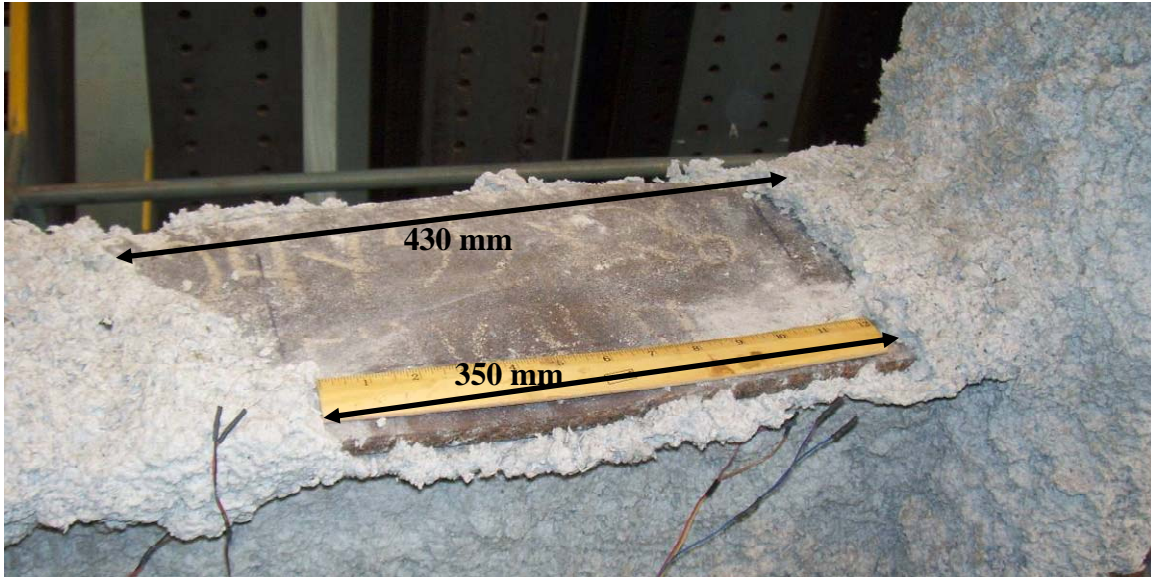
Top flange of DM assemblage after loose SFRM was removed during post-testing inspection
